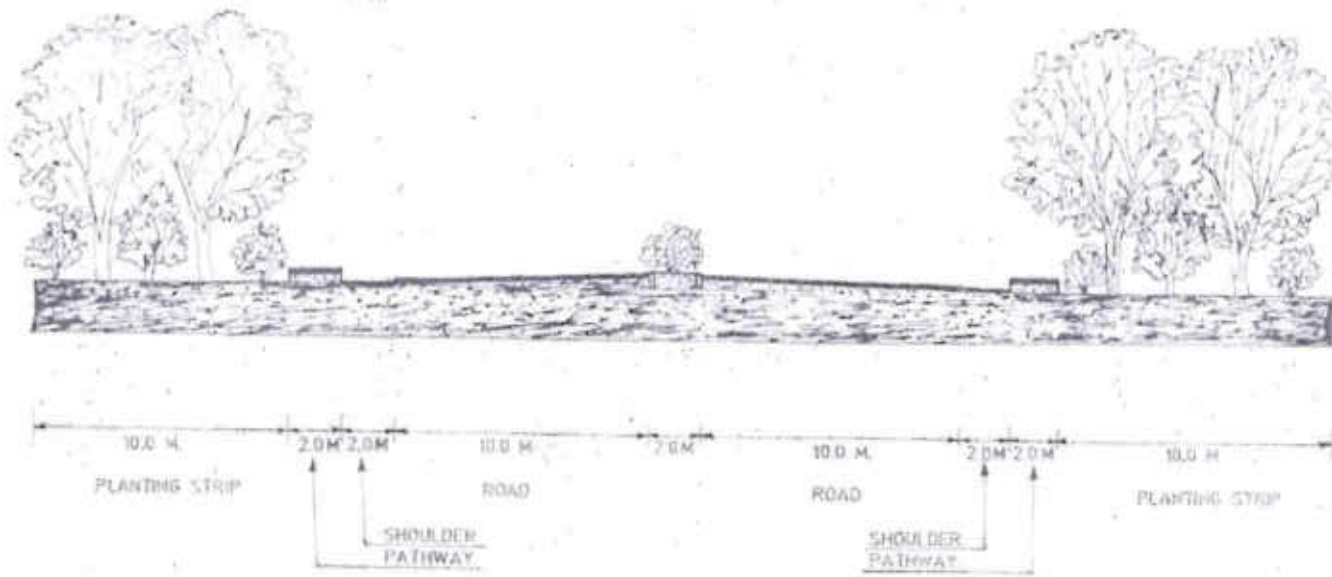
TYPICAL ROAD-SIDE PLANTATION
